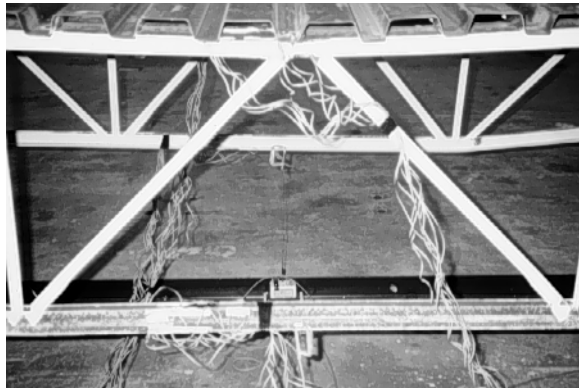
Failure Mode for 26K5-PW-2 East Joist
